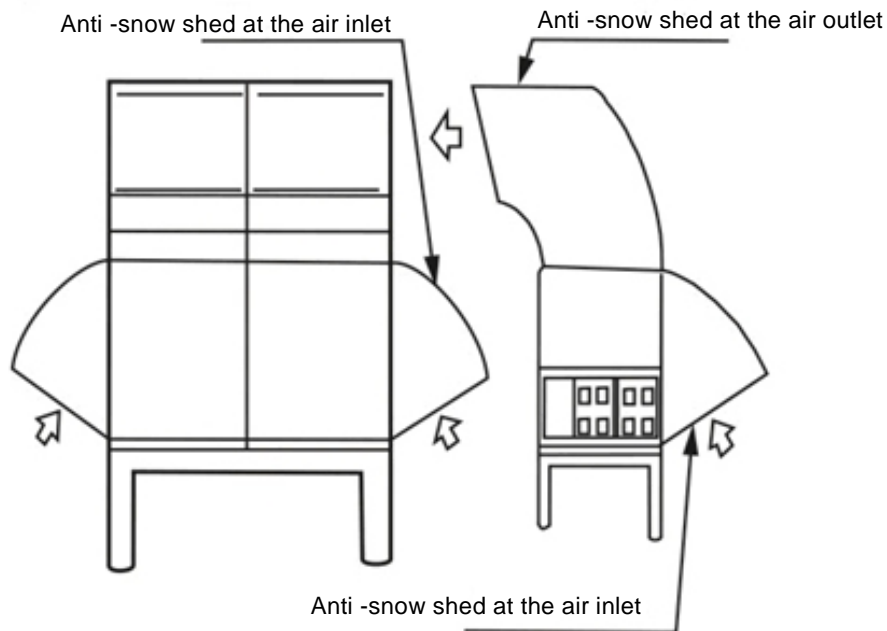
Anti -snow shed 's installation sketch map of outdoor units
